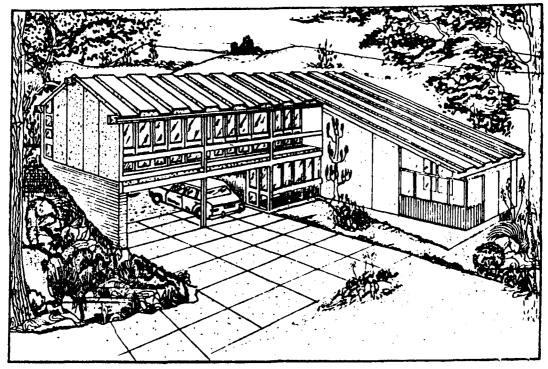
A proposed house using floor, wall and roof panels made from fibrous ferrocement.
